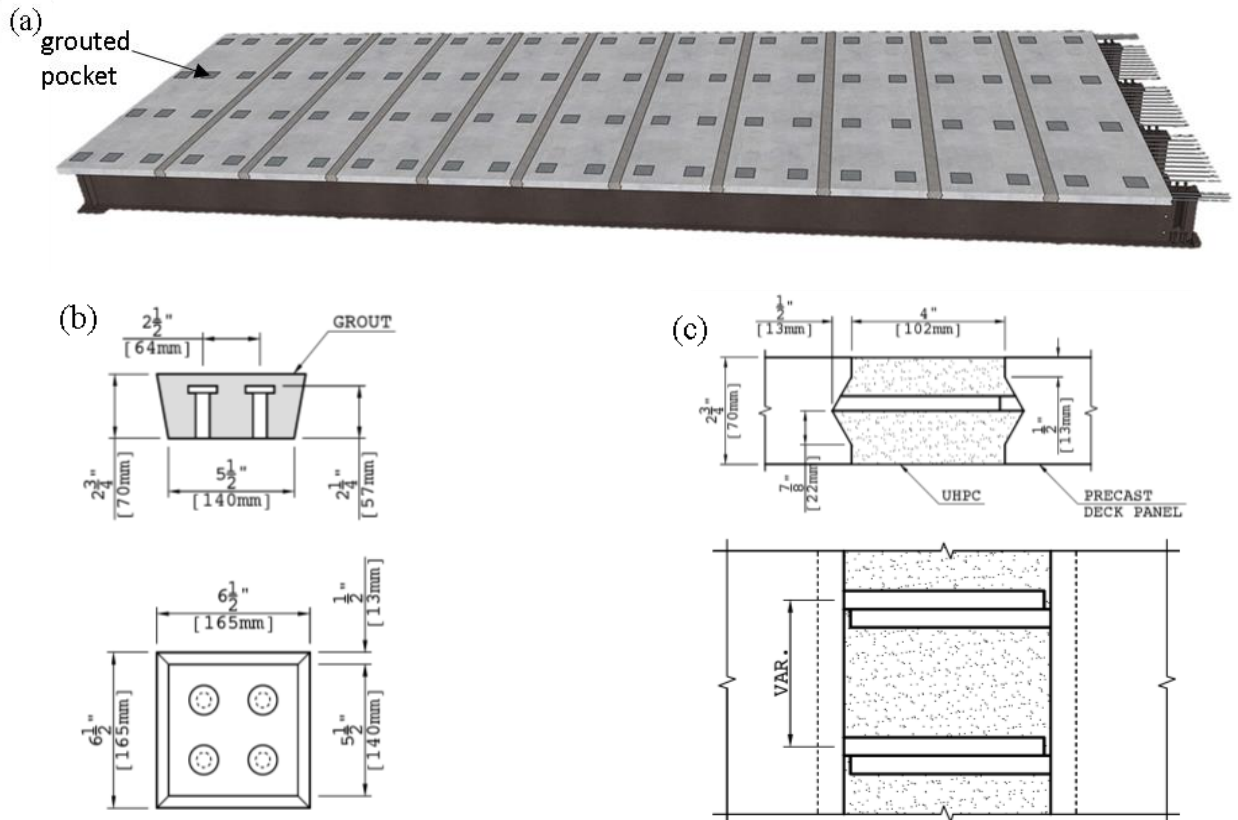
(a) The schematics of the superstructure of one span, (b) Details of the deck-to-girder connection, (c) Details of the deck transverse joints
